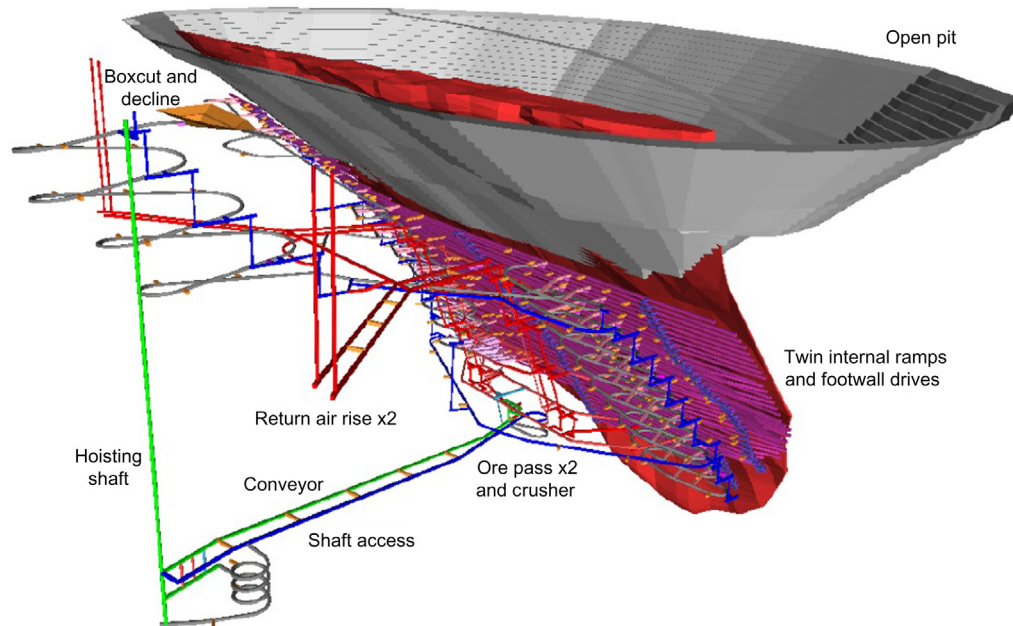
The isometric view of the open pit and the proposed underground mine at Rampura-Agucha.
